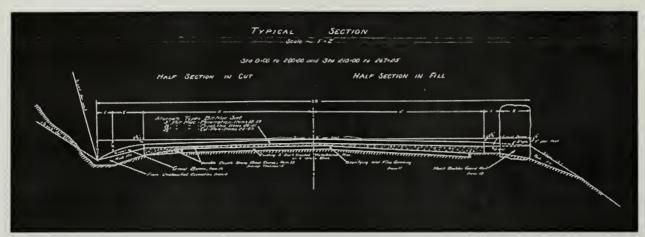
Cross-section diagram for Jordan Pond/Eagle Lake Road, 1935, showing a 28-foot cross-section that includes a 22-foot traveled way, 2-foot shoulder in cut, and 3-foot shoulder in fill (1-foot if guardwall present). (U.S. Department of Agriculture, Bureau of Public Roads, Project 3A1, Sheet 2 of 22, 1935)
